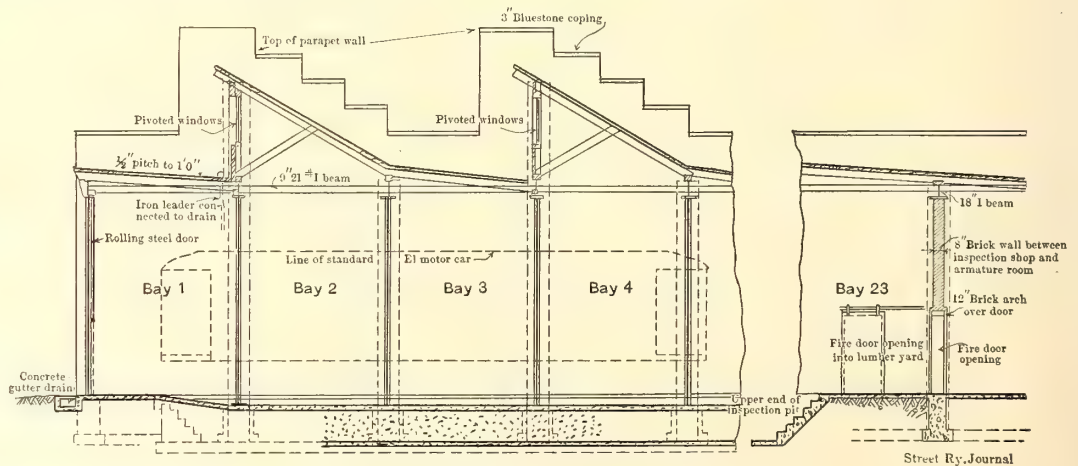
PART LONGITUDINAL SECTION OF THE INSPECTION SHOP AND ADJACENT ARMATURE ROOM
